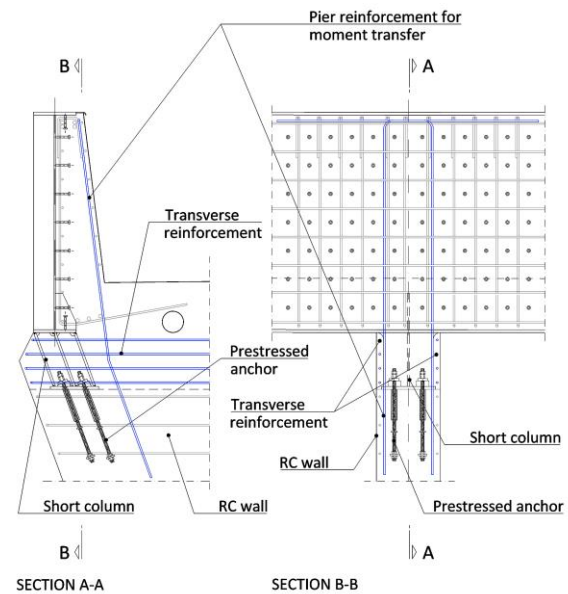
Monolithic connection between composite girder and reinforced concrete pier wall.
